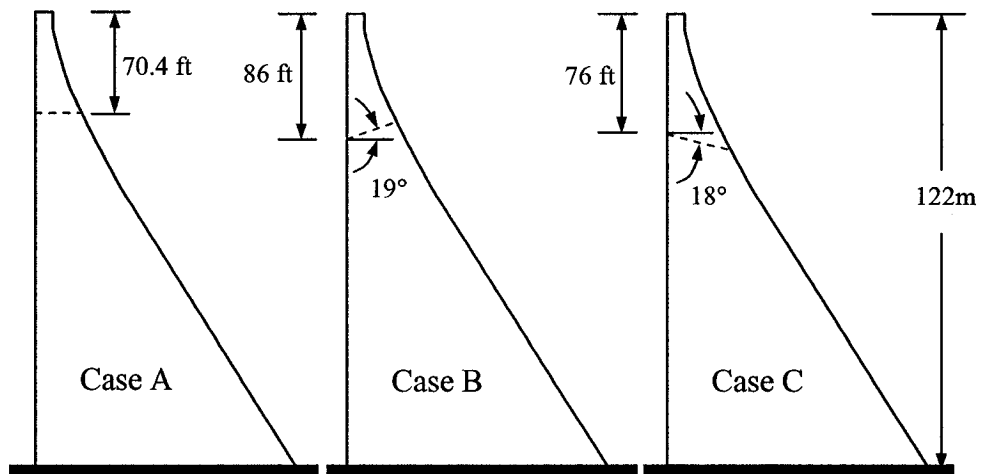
Pine Flat Dam with assumed initial crack (El-Aidi and Hall, 1989)
